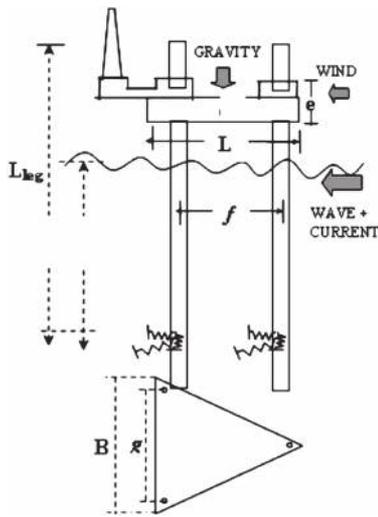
Schematic diagram for the elevation and the plan views for the jack-up platform.
